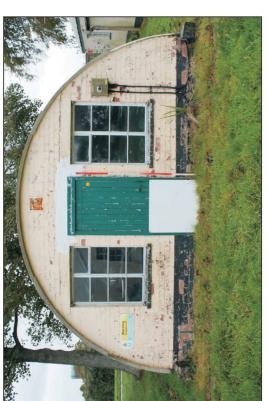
Building 60, curved asbestos hut, viewed from the west. 2m scale
